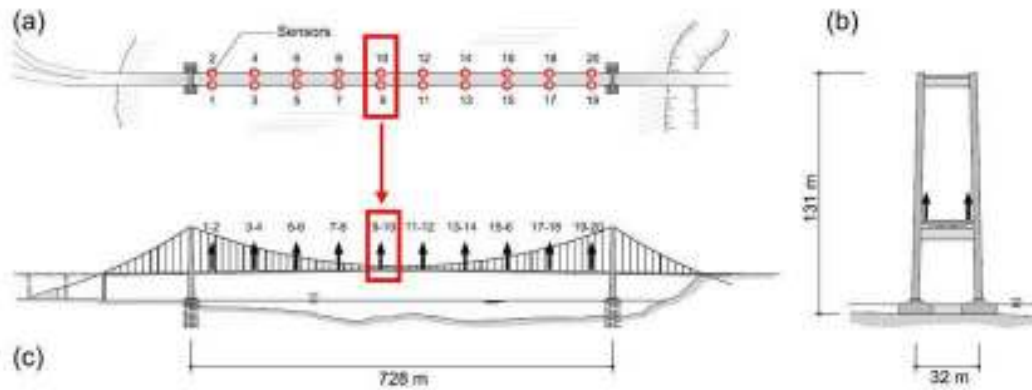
Case study bridge with ideal sensors' layout: plan (a), cross section (b) and elevation (c).
